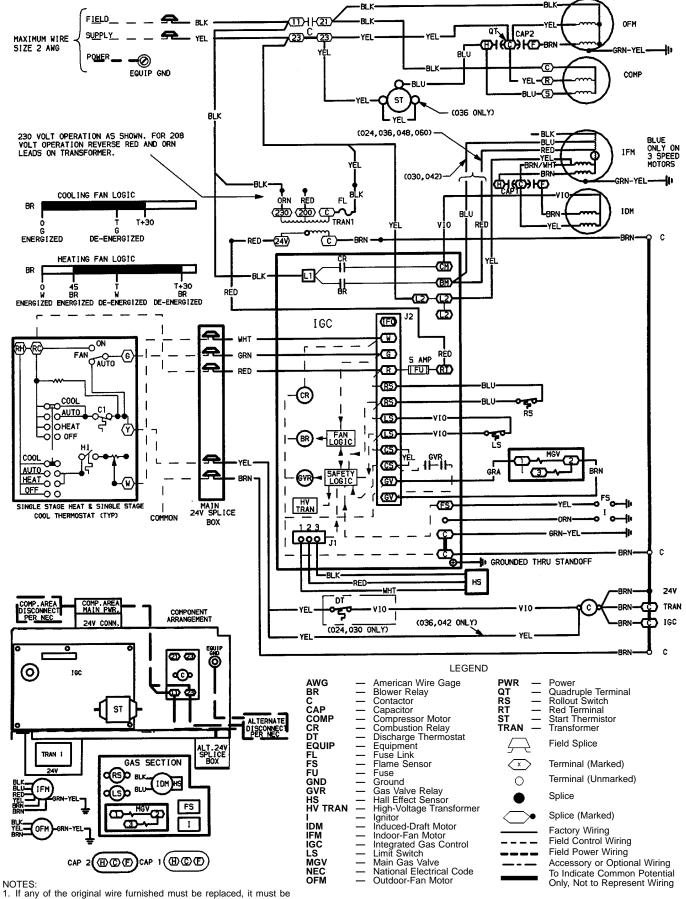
208/230-3-60 Wiring Diagram, Units 48SS030-060
